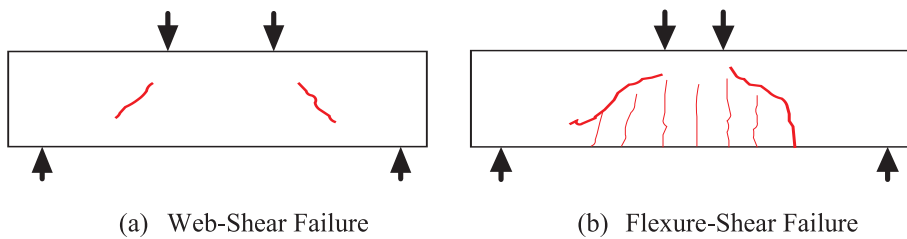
Shear Failure Modes in Prestressed Concrete Members.
